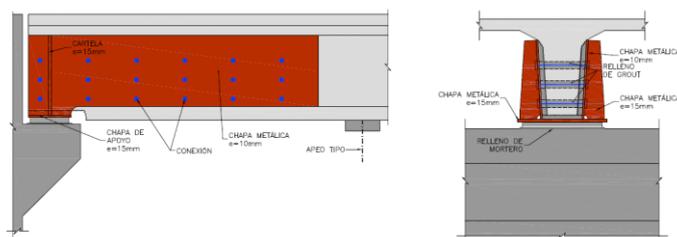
Reinforcement of prestressed concrete beams with steel plates
